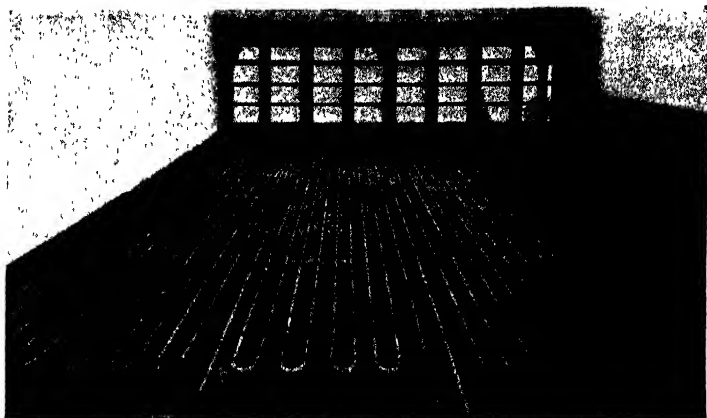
A METHOD OF HEATING A LARGE ROOM BY PIPES LAID UNDER THE FLOOR BOARDS.
